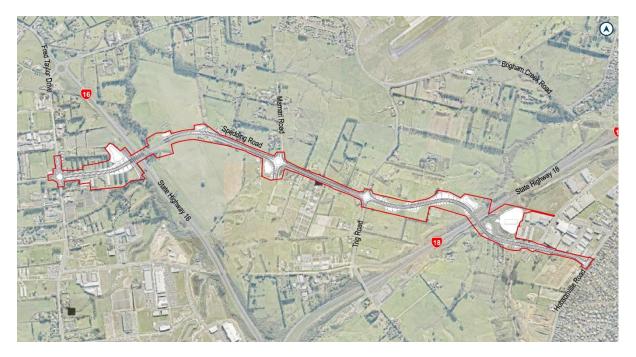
NOR W4 Spedding Road upgrade and extension overview
